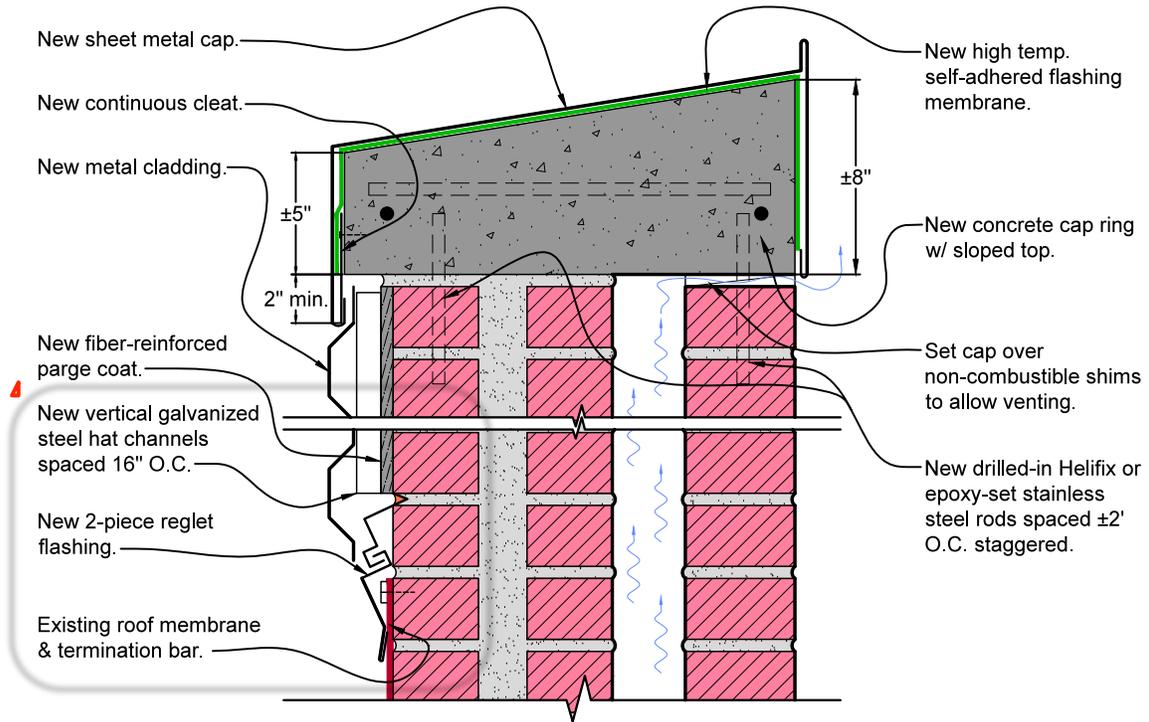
(1): Recommended Modifications at Chimney-Roof Junctures
